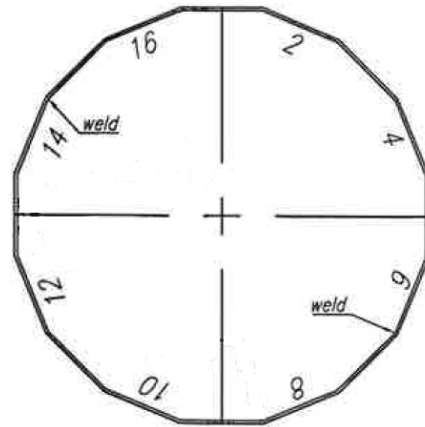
Cross-section of pole segment. Numbers indicate the side numbers. Longitudinal welds are located (Technical drawings).
